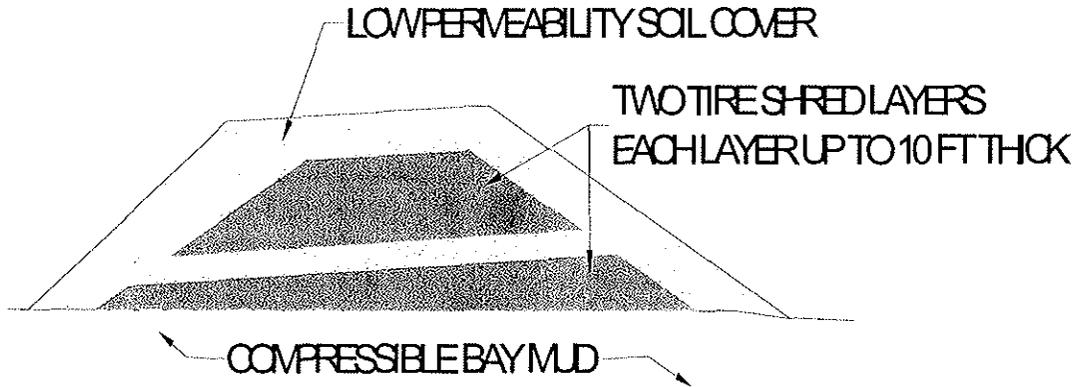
Typical cross section, Dixon Landing Interchange.
